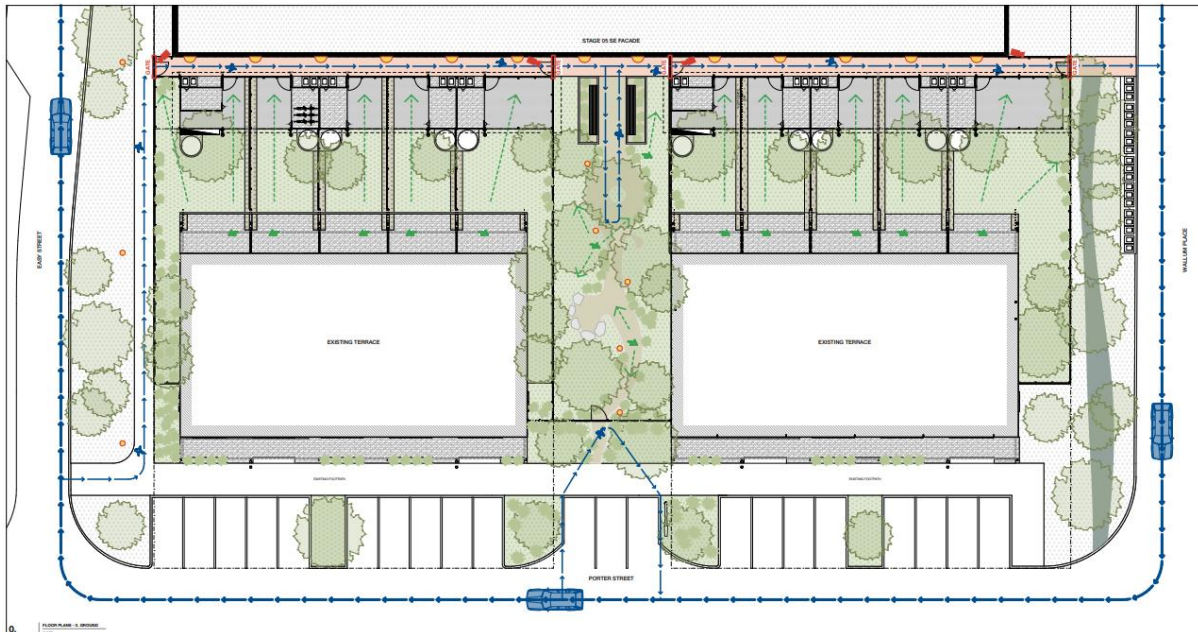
Updated CPTED plan – lighting and gates will be installed on the walkway.
